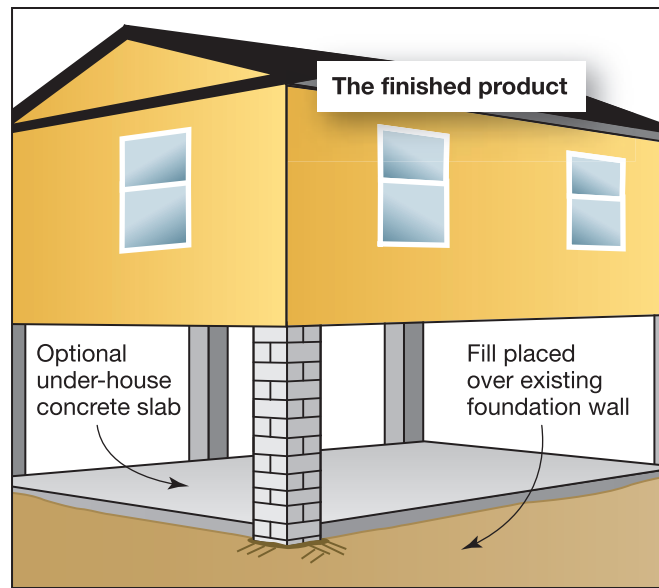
E-12. Elevated wood-frame house set on new reinforced piers on top of the existing filled-in basement
